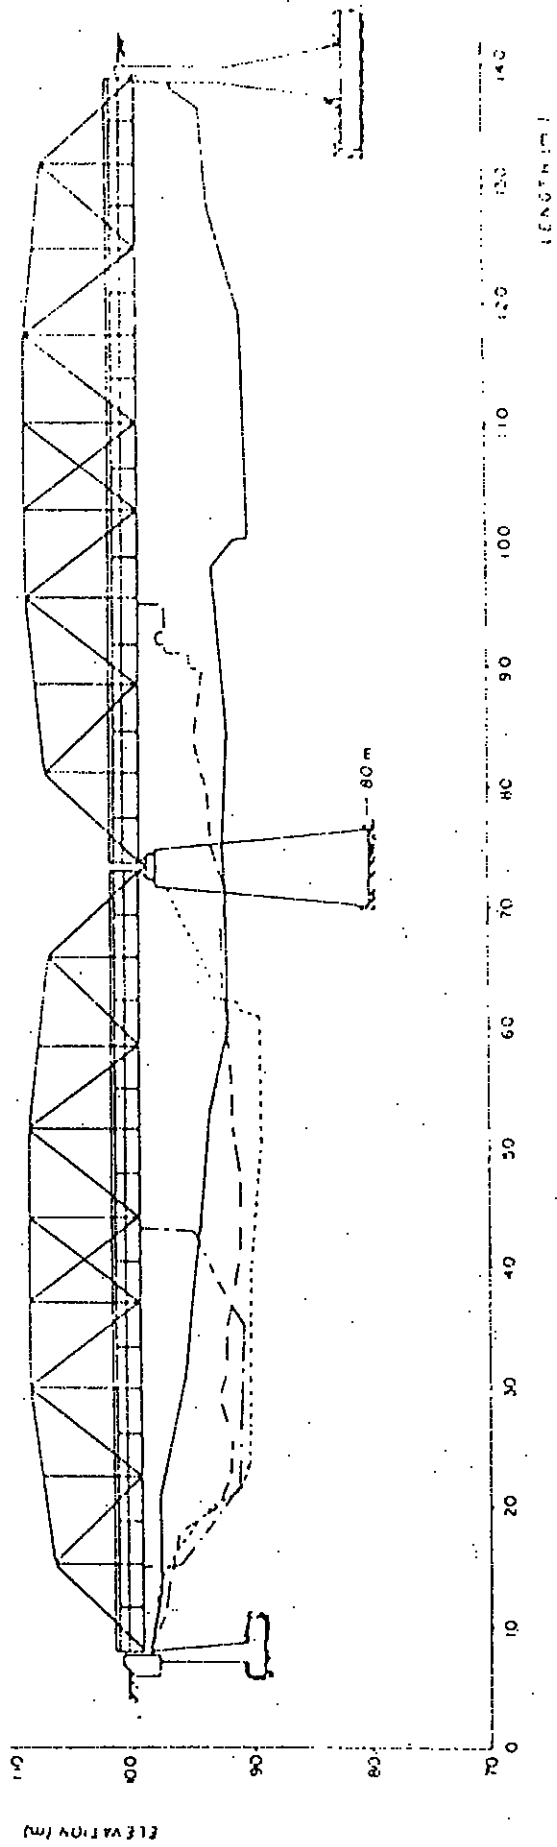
TRANSITION OF CROSS SECTION AT ROAD BRIDGE IN PANTALEON
